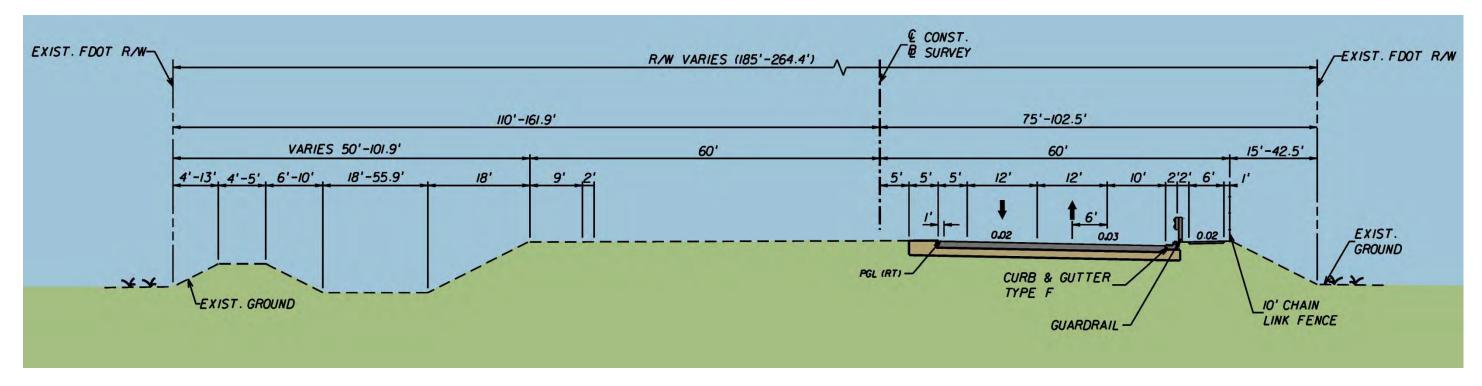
Proposed Typical Section-Okeechobee Boulevard to Madrid Street
